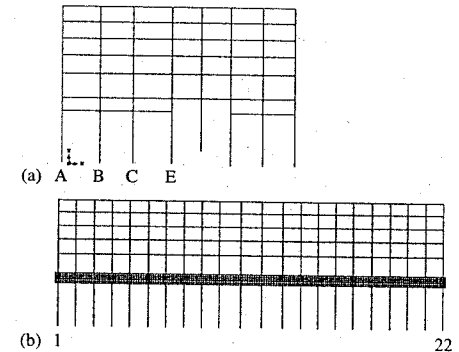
Frame models for the transverse section (a) and the longitudinal section (b). Labels refer to column lines.
